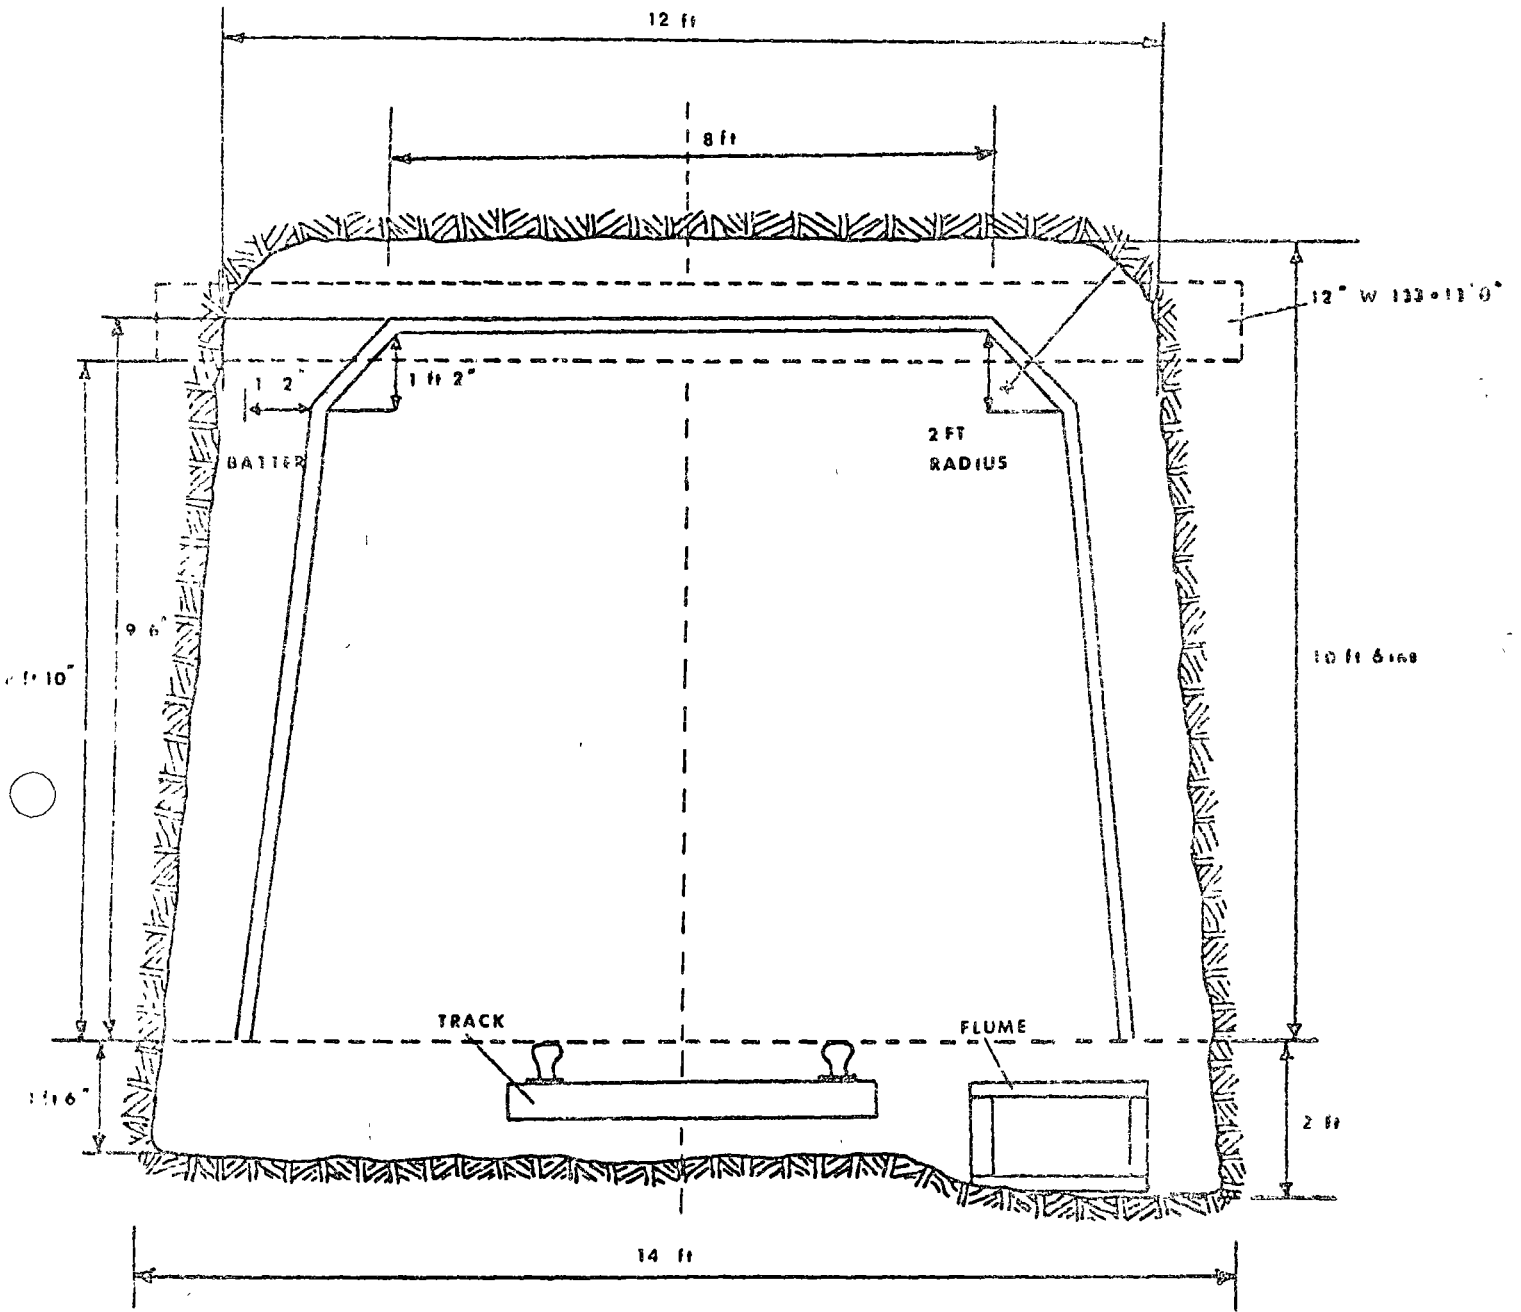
Haulage and Fringe Drifts (Concrete - plywood forming)
